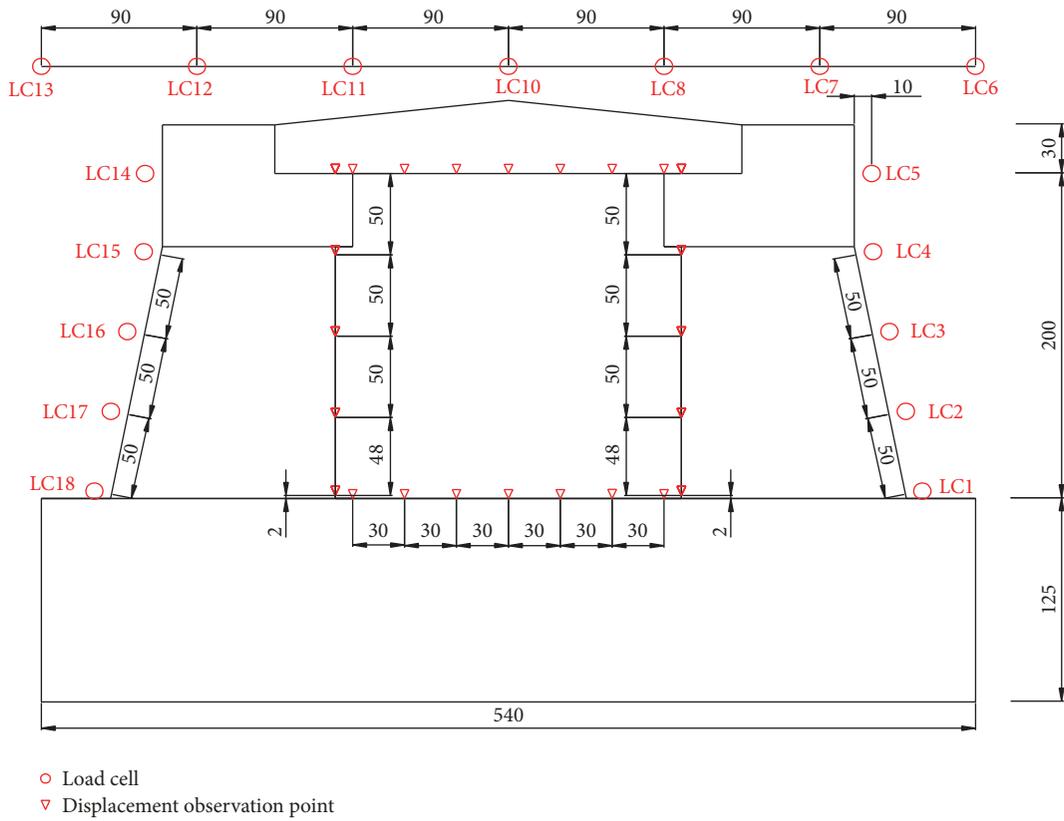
Test section and instrument layout of culvert (unit: cm).
